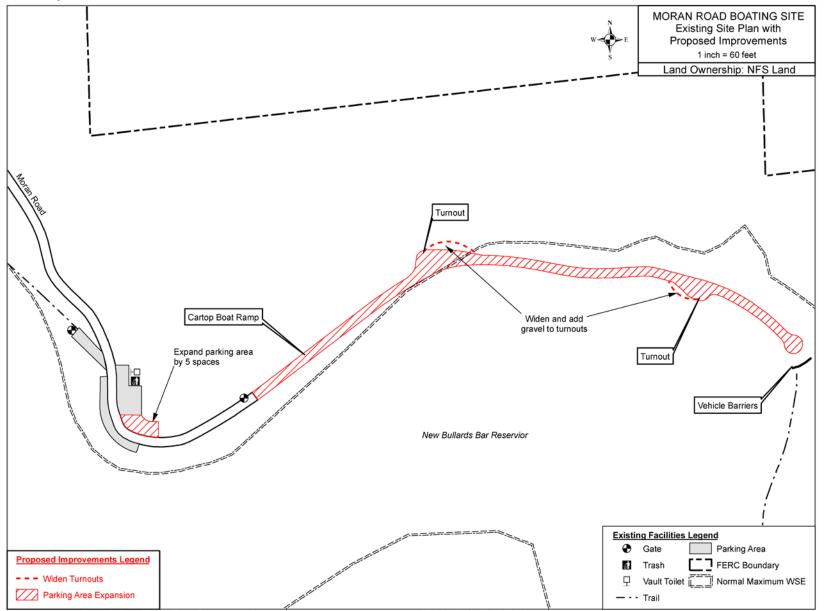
Existing site plan with proposed improvements for Moran Road Boating Site.
